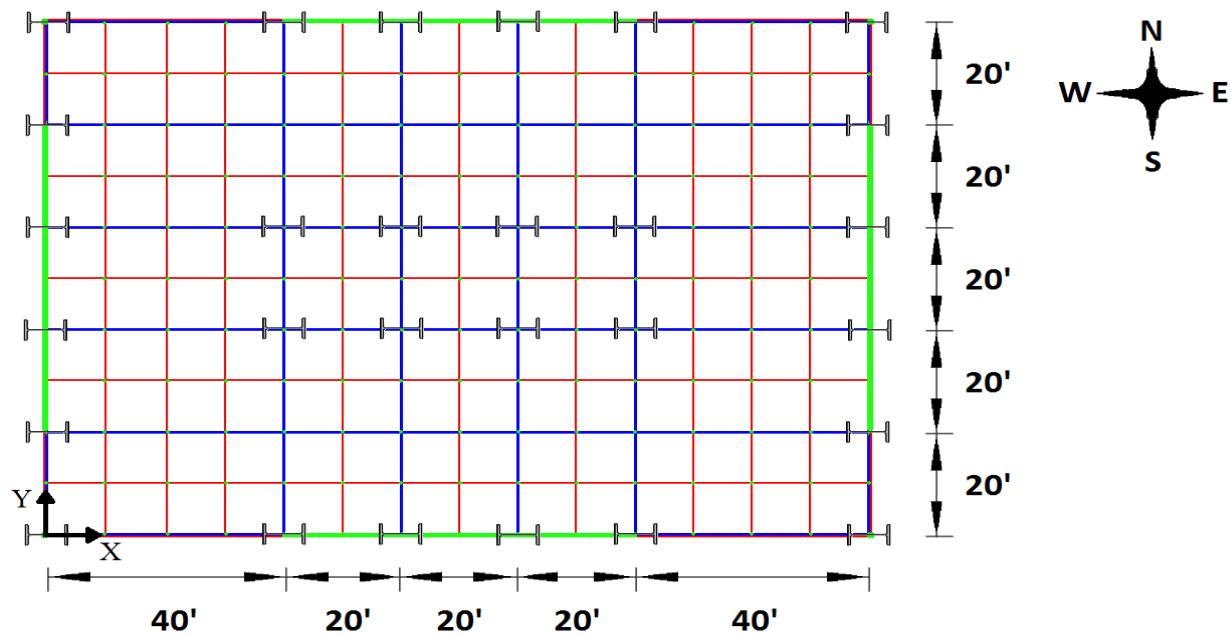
Plan view of the 20-story office building. The special steel moment frames are highlighted in green.
